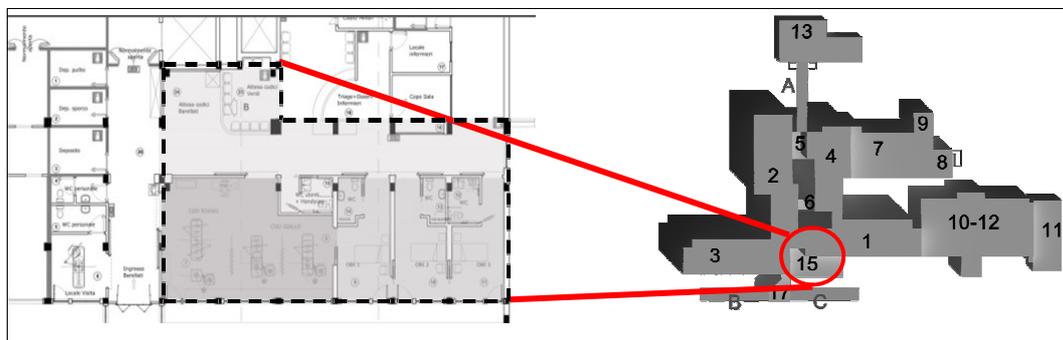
Architectural plan of Building No. 15 and position into the hospital complex.
